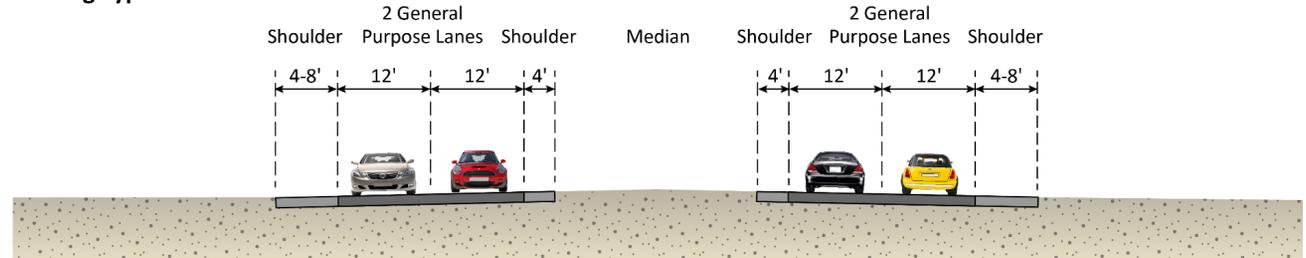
Preferred Alternative Elements, Proposed and Existing Typical Sections
